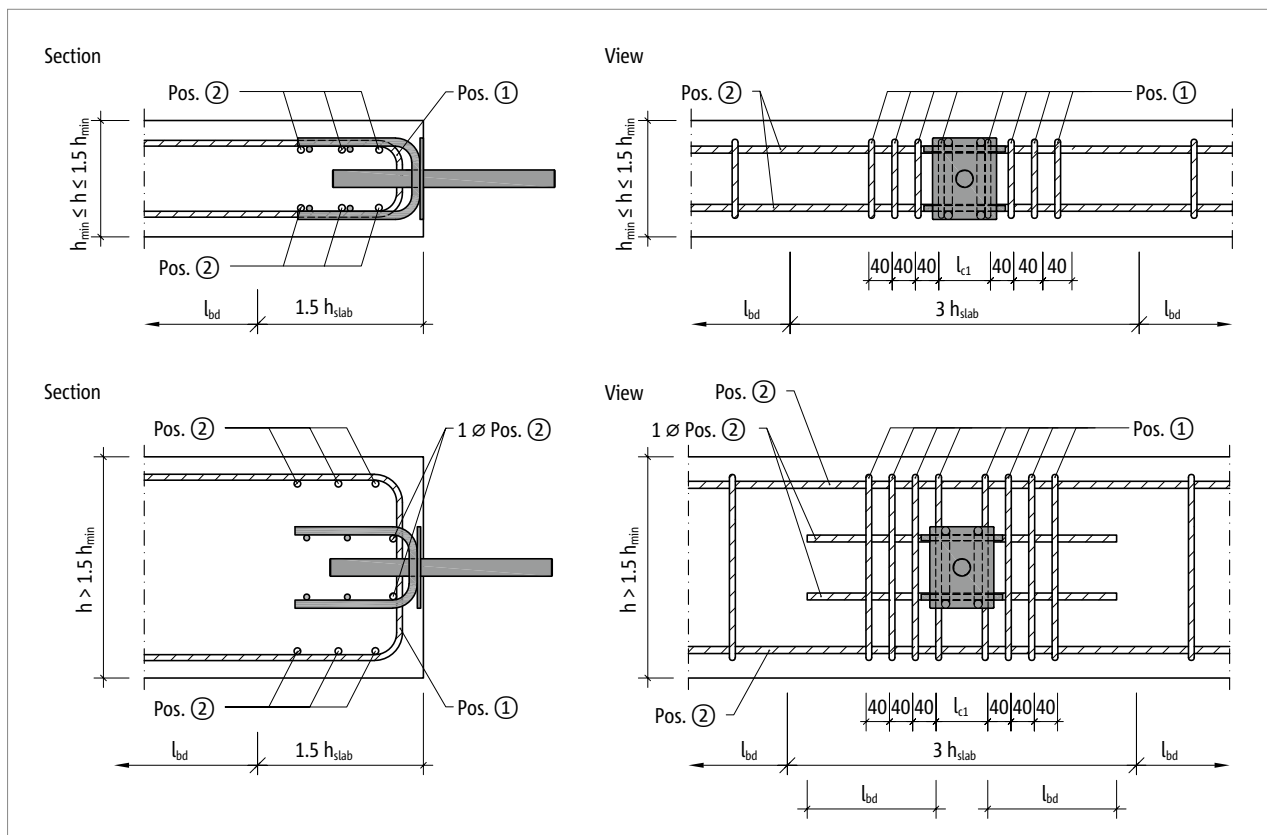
On-site reinforcement with Schöck Stacon® type SLD
